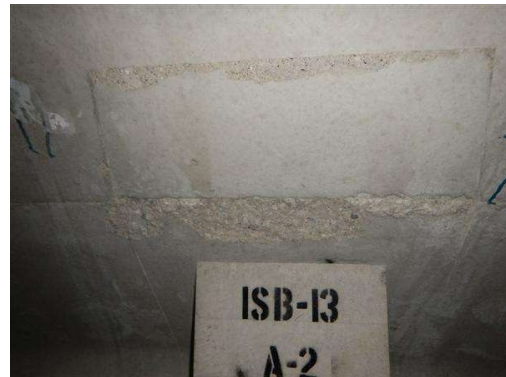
Spall in the top flange over PT block in Span 1SB looking Northwest
